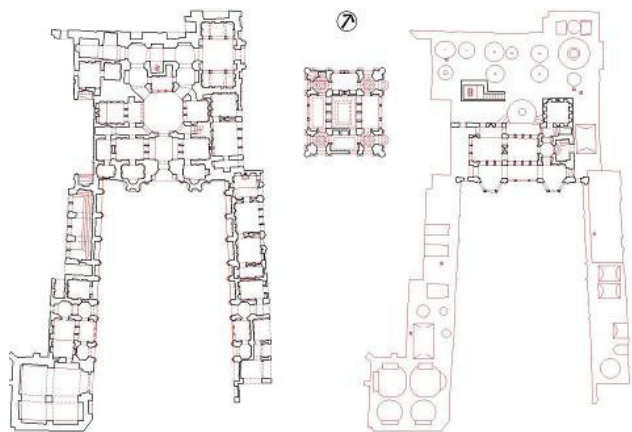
Plan of Fathabad Pavilions, left: ground floor of the main pavilion, middle: plan of the second pavilion, right side: first floor of the main pavilion. Source: Authors.
